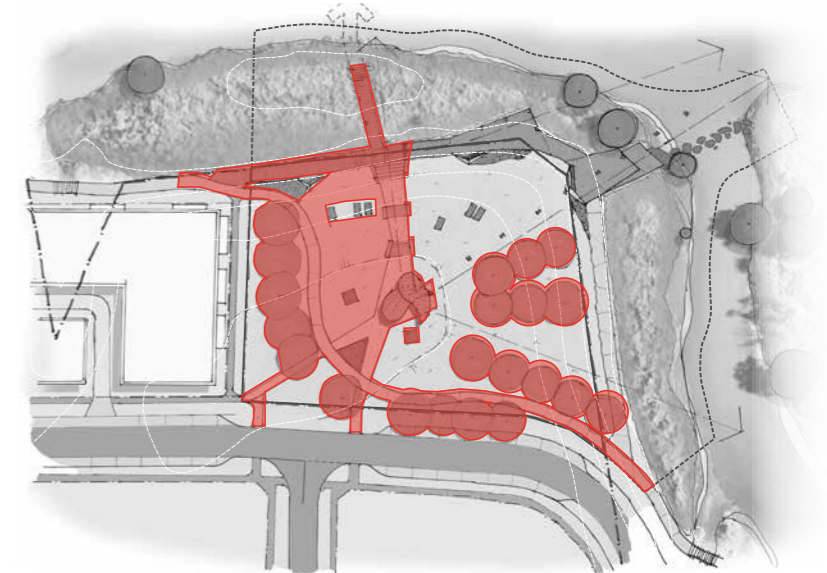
A: F-01 Landscape Masterplan Stage 1 Plan
